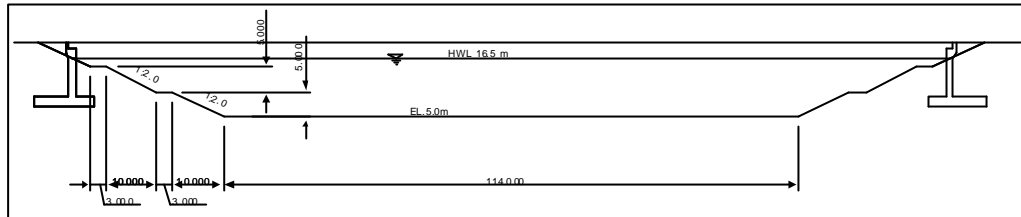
River Cross Section at the Moat Khmung Bridge
